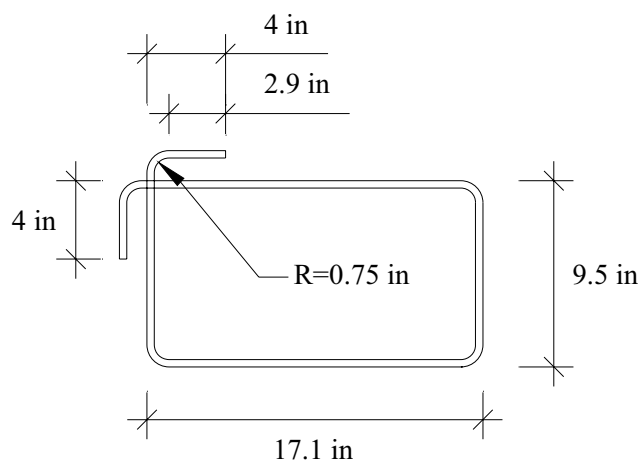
Overlapping Tie Type A; Specimens B1, B2 & B3
